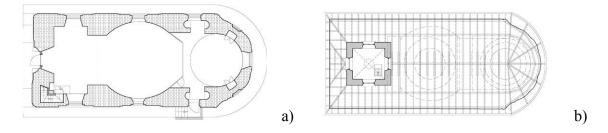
a) plan of Cornesti Church; b) Roof plan (Belfry); (drawings by A. Cehan)
